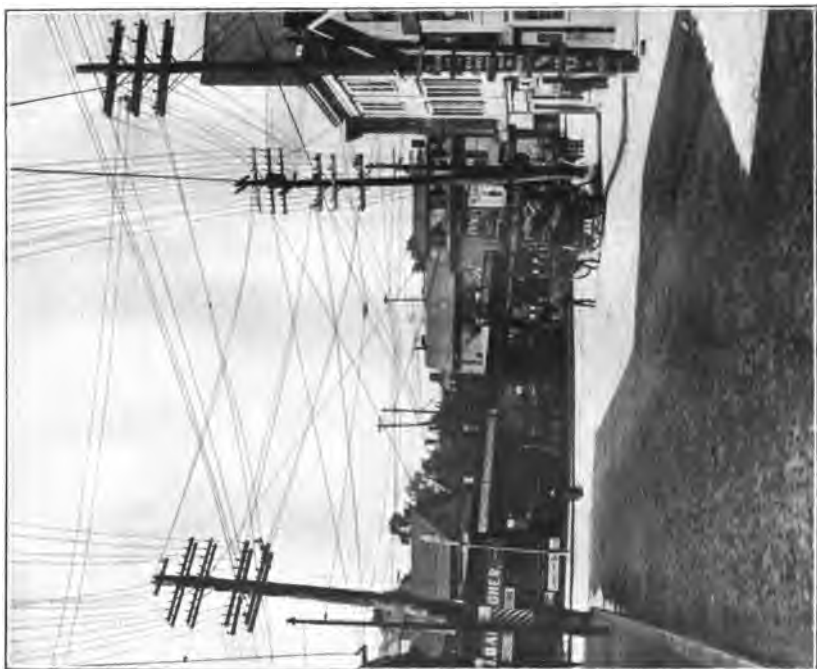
ROXBURY STREET AND GUILD ROW, WITH WIRES.
